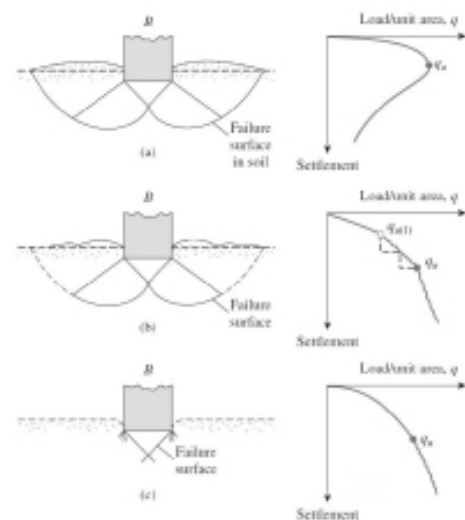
Types of bearing capacity failure modes in foundations: (a) general shear failure, (b) local shear failure and (c) punching shear failure [6]
